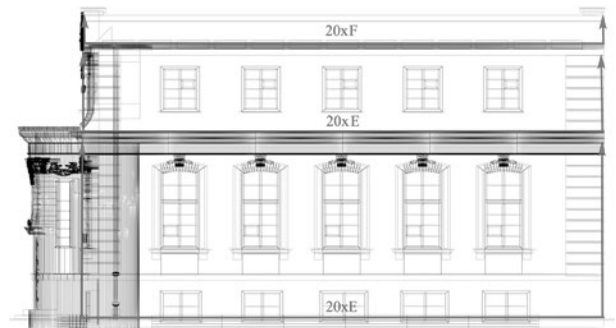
Scheme of location and angle of direction of the lighting equipment (east wall)
